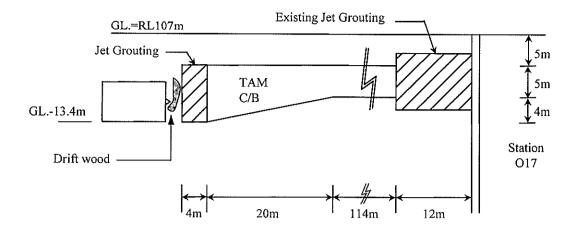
Ground treatment at the up-track tunnel of Contract CC277 of TRTS
